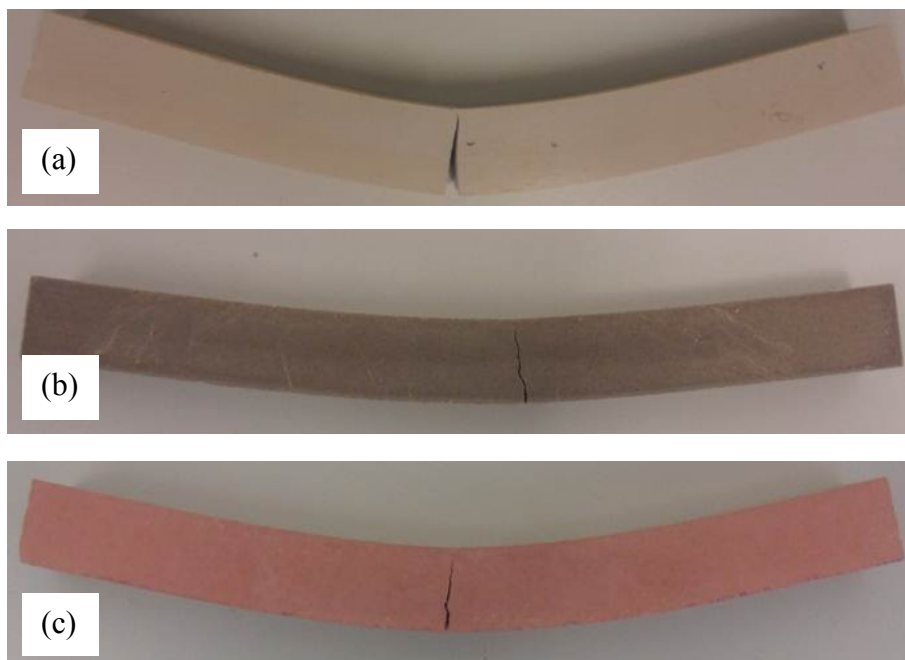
Typical flexural failure of the specimens; (a) grout C, (b) grout D and (c) grout E
